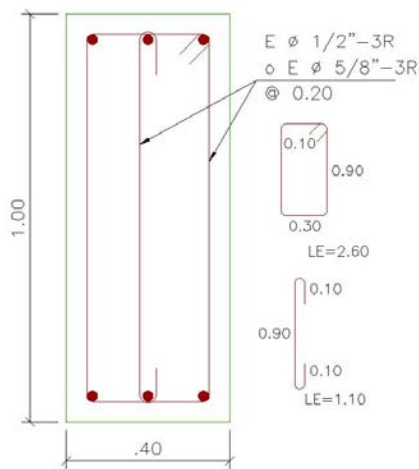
Typical section of foundation beam (transverse section). Seven story project. Photo courtesy of Alvaro P
